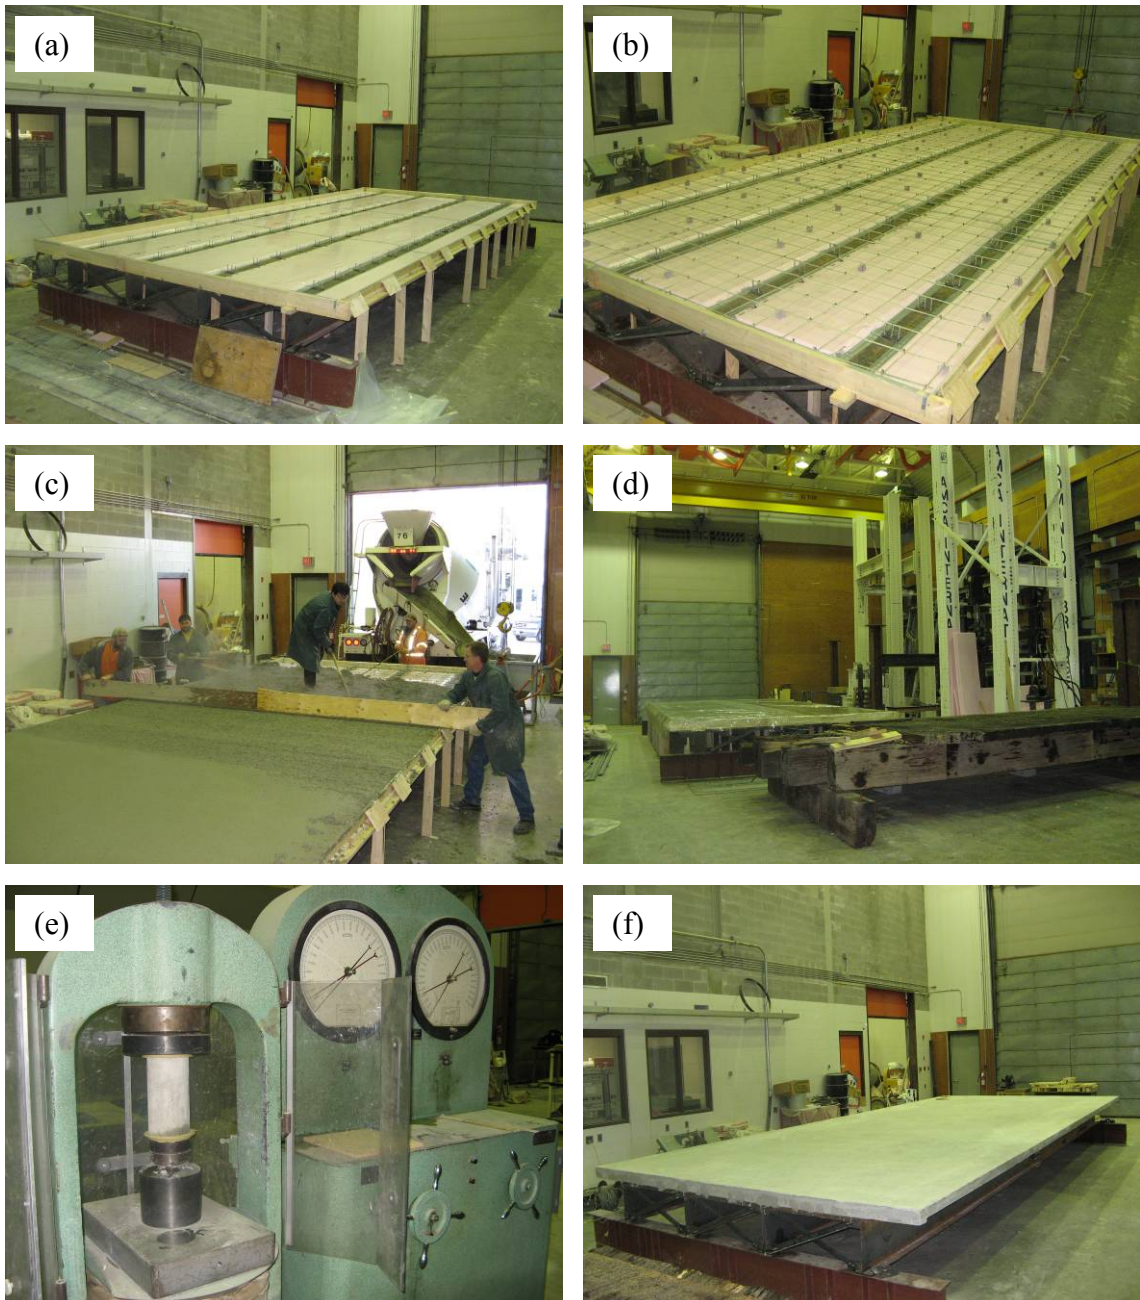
Construction of the concrete deck of the bridge model: (a) formwork, (b) FRP rebars, (c) pouring concrete, (d) curing concrete, (e) testing a concrete cylinder, and (f) the finished composite bridge model.
